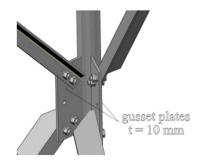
Connections of diagonal bracing members with legs at section's span centers.
